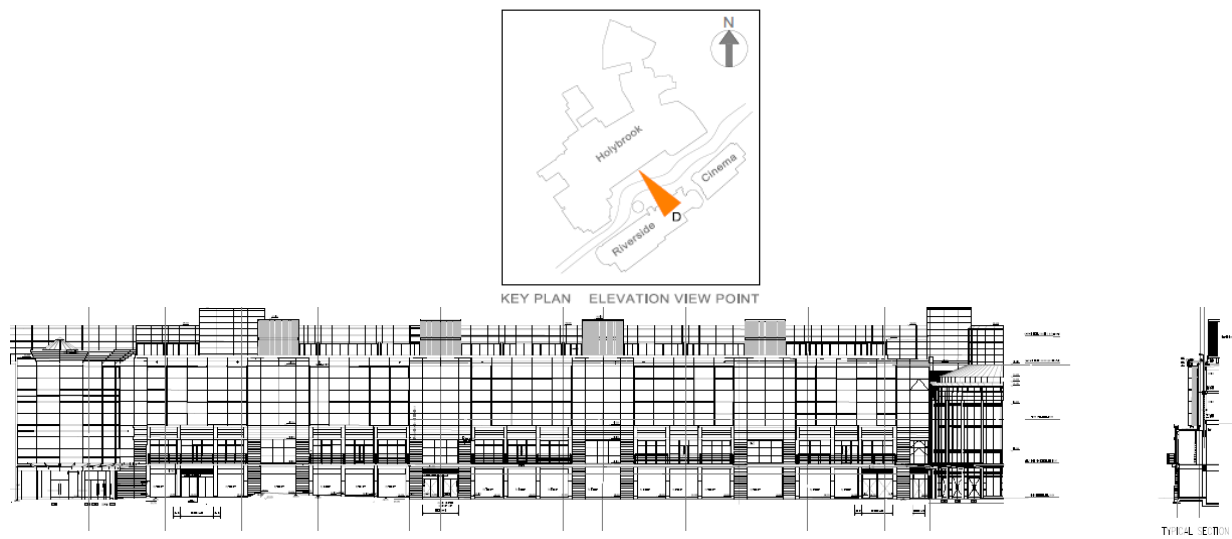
Existing south elevation of The Oracle building to the north side of the Kennet visible from The Oracle riverside area
